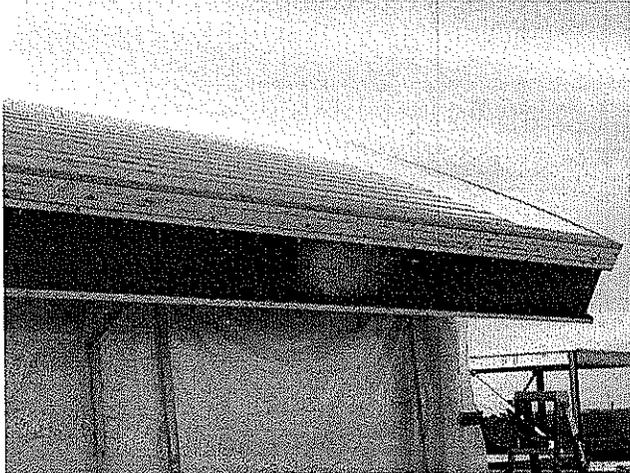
View northwest of the 4th floor segment E barrel roof. February 17, 2011.
